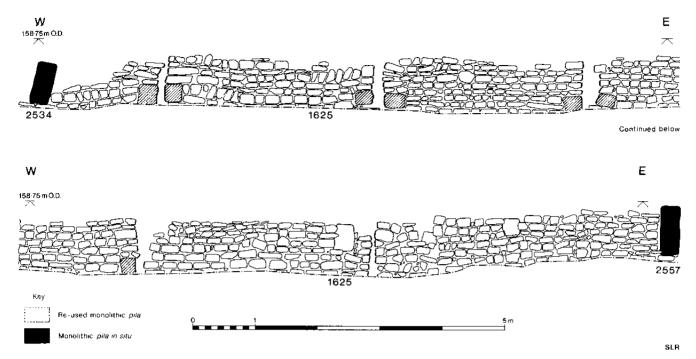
Elevation L (for location see Fig 69): south elevation of sleeper-wall 1625
